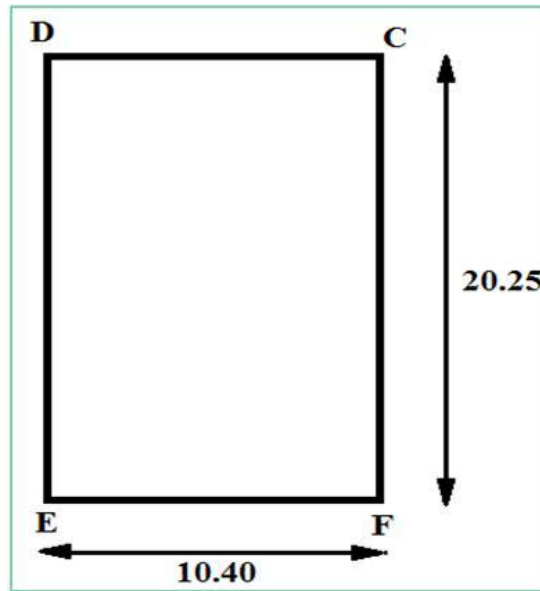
Plan of Test Single Storey Roof Slab (B)
